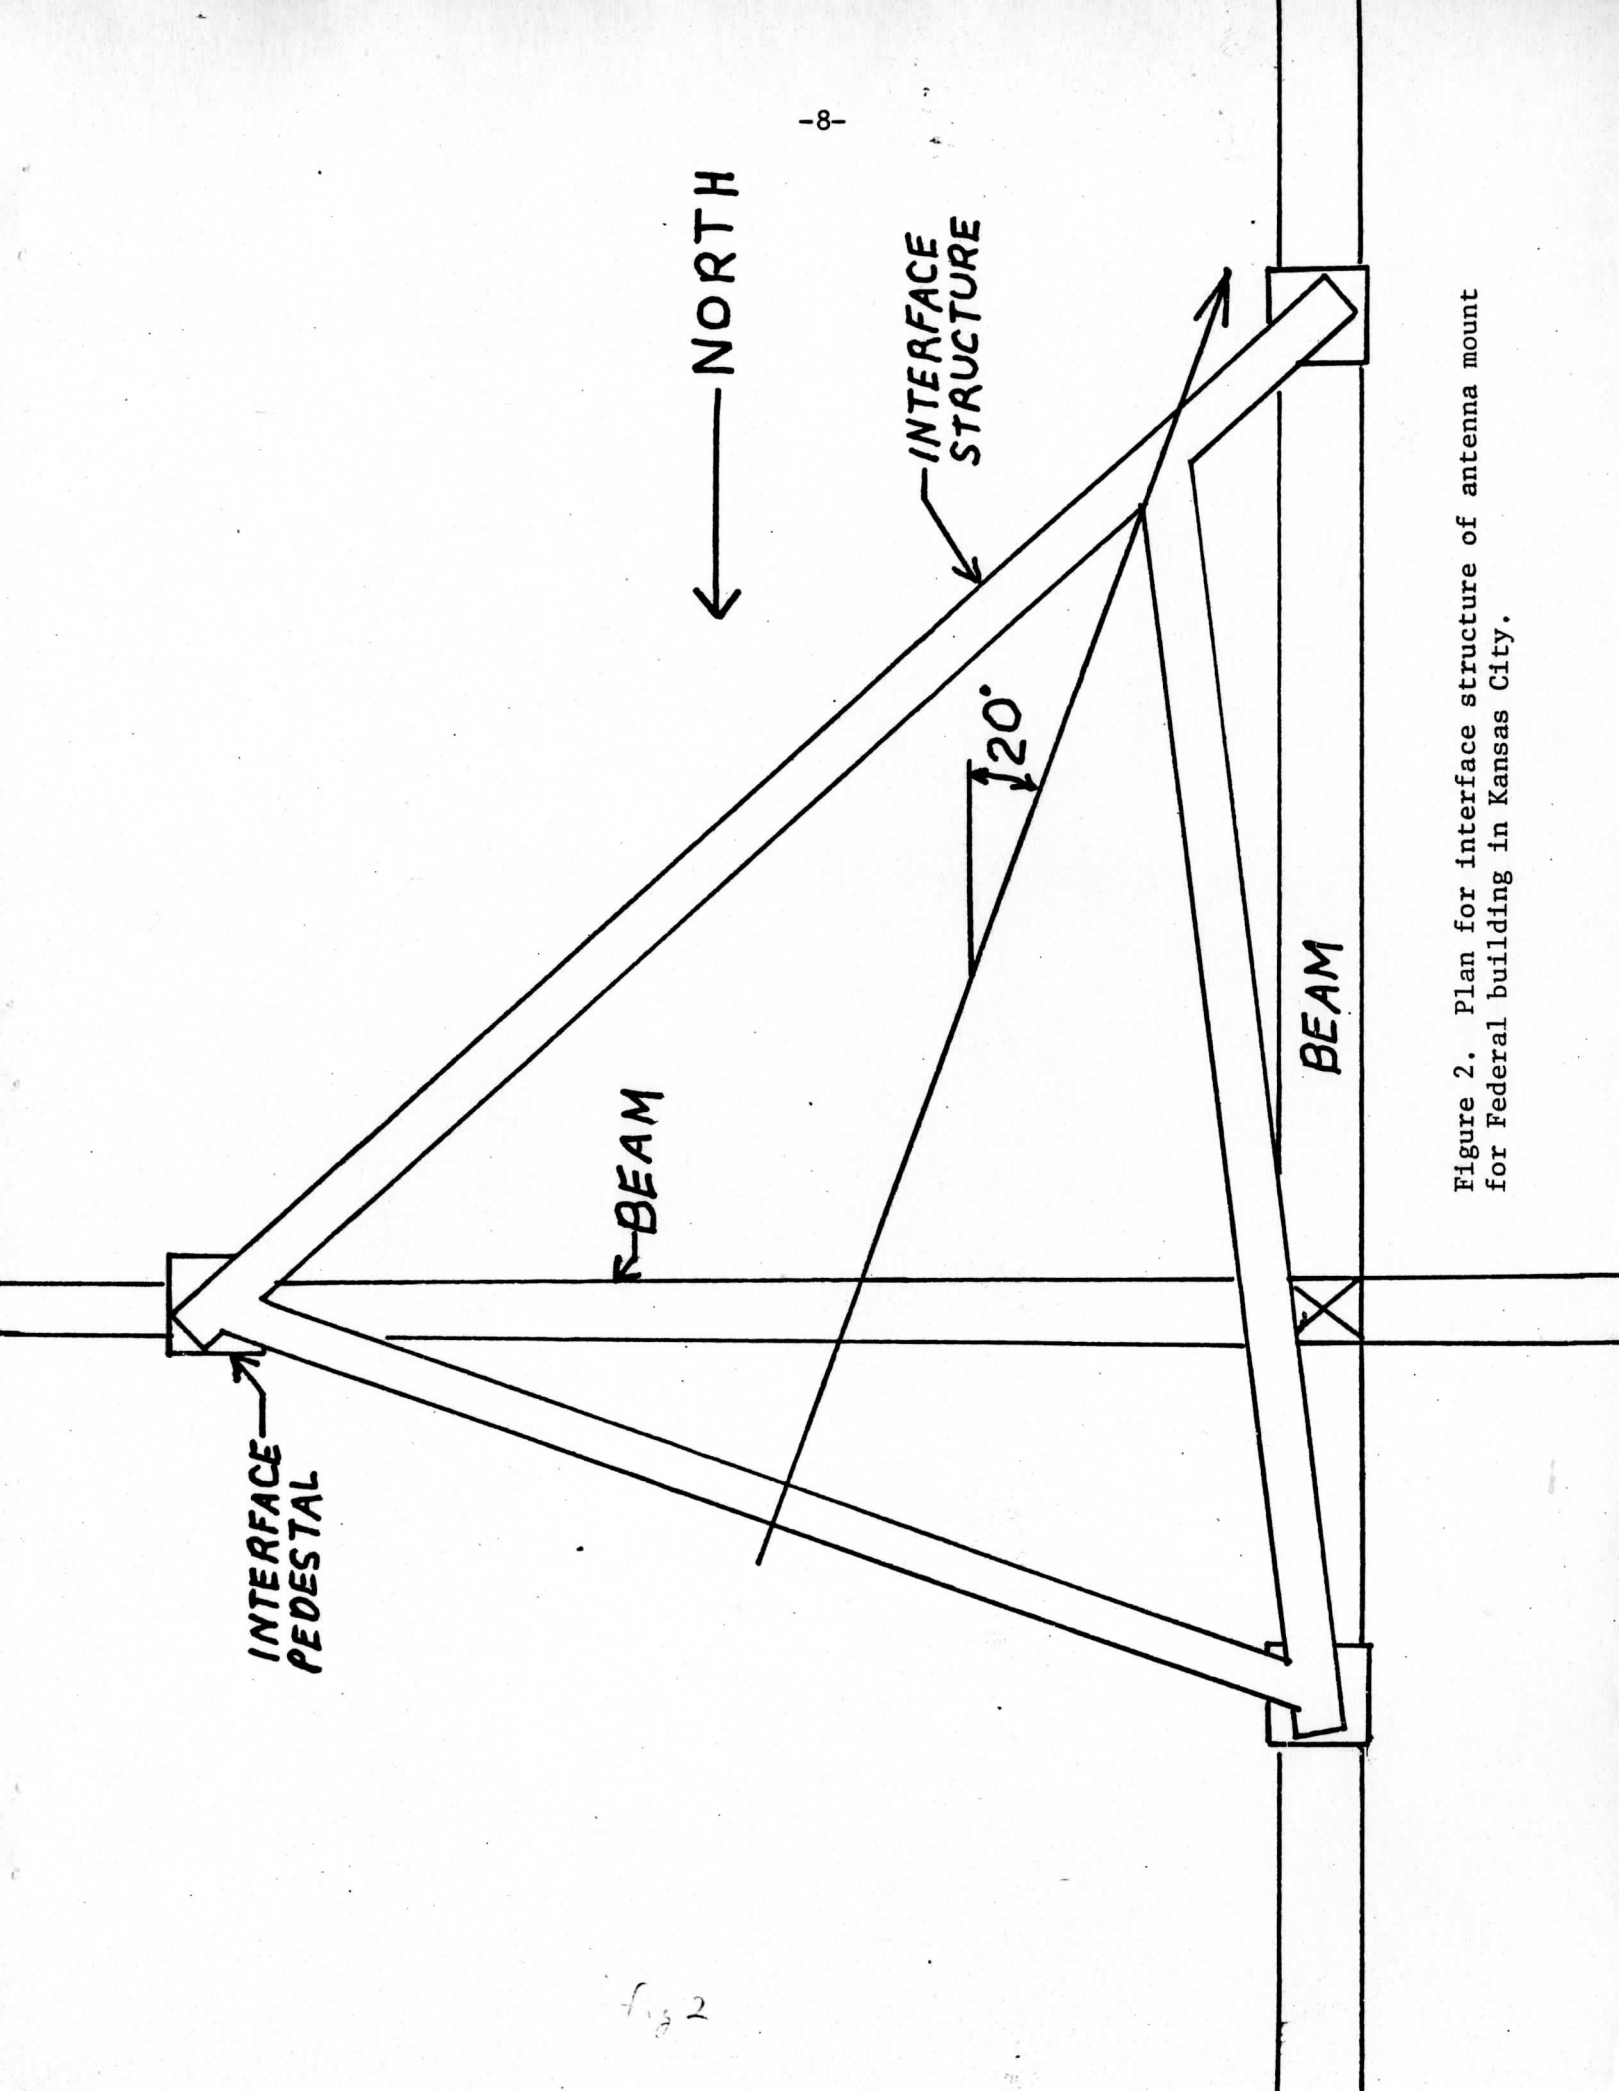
Plan for interface structure of antenna mount for Federal building in Kansas City.
